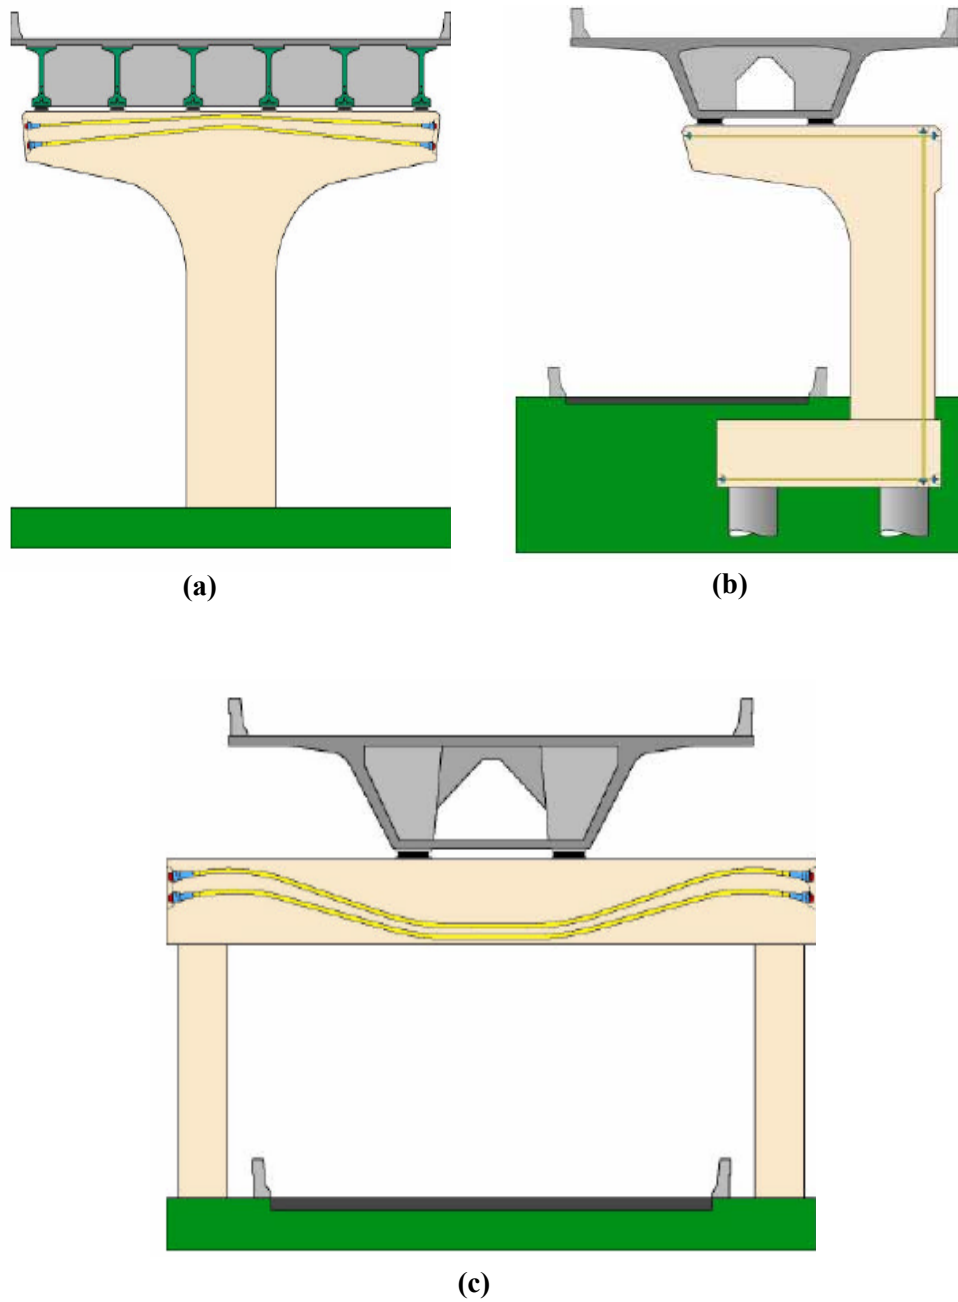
Post-Tensioning in (a) Hammerhead Piers, (b) Cantilever Piers, and (c) Straddle Bents¹⁶
